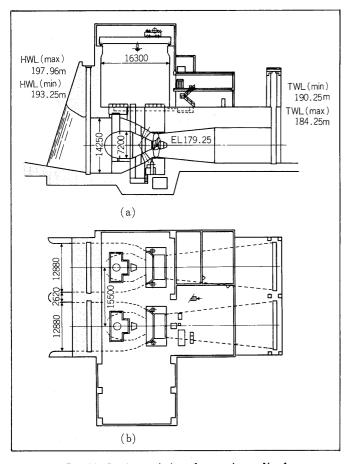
Section and plan of power house No. 1 (Low Mettur Project)
